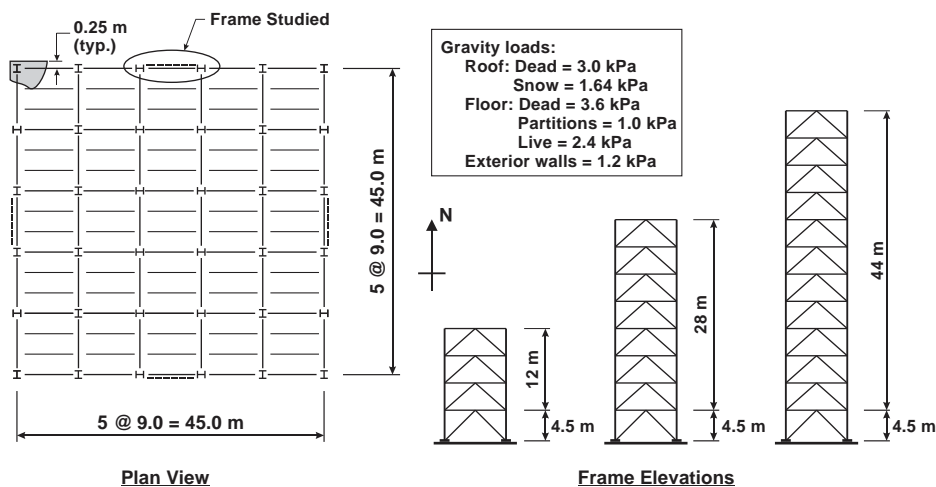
a) Structures studied; b) Proposed bracing configuration.
